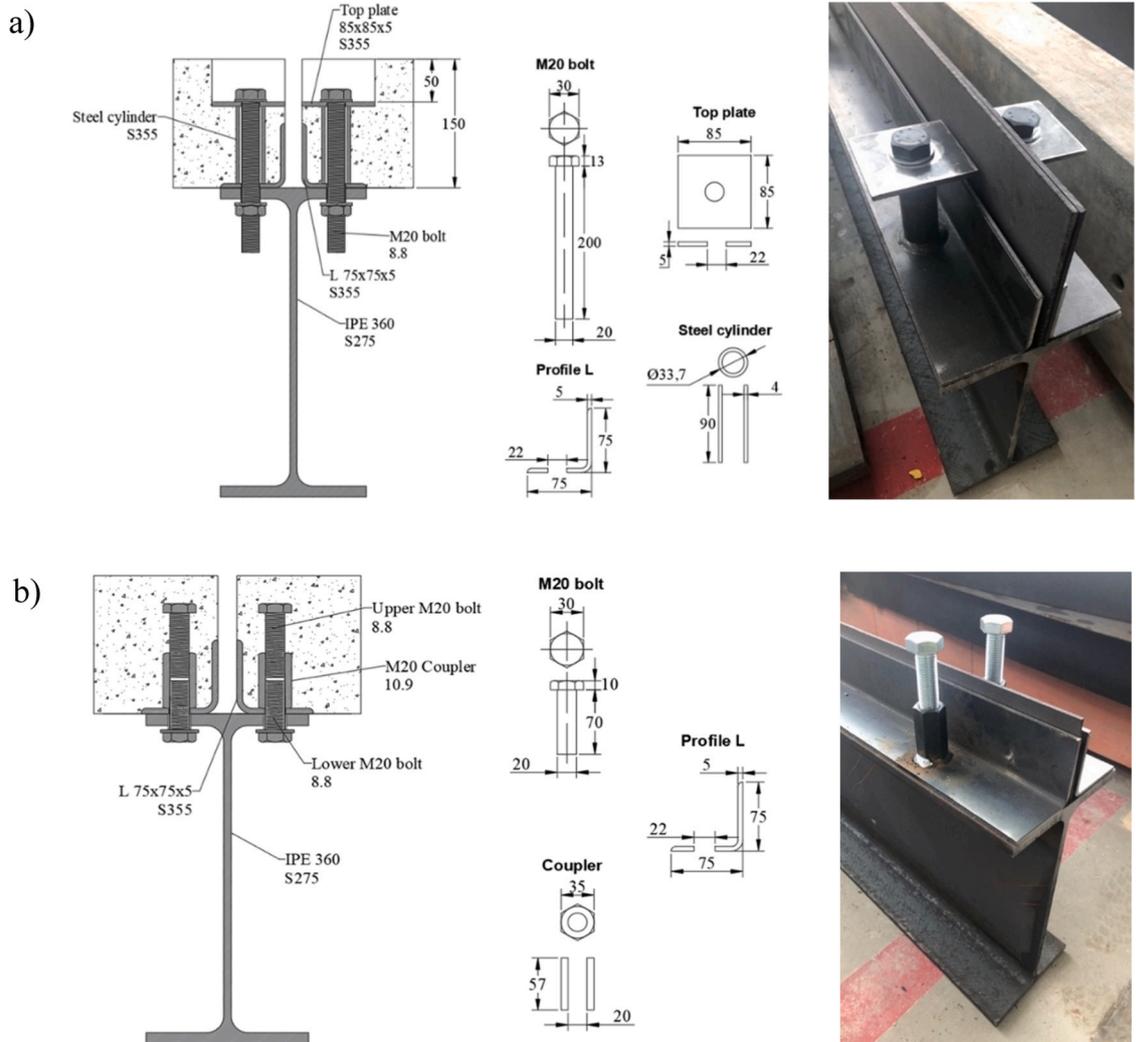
Details of the connection systems used in the tested beams: a) "Cylinder system" (P3); b) "Coupler system" (P15) (dimensions in mm).
